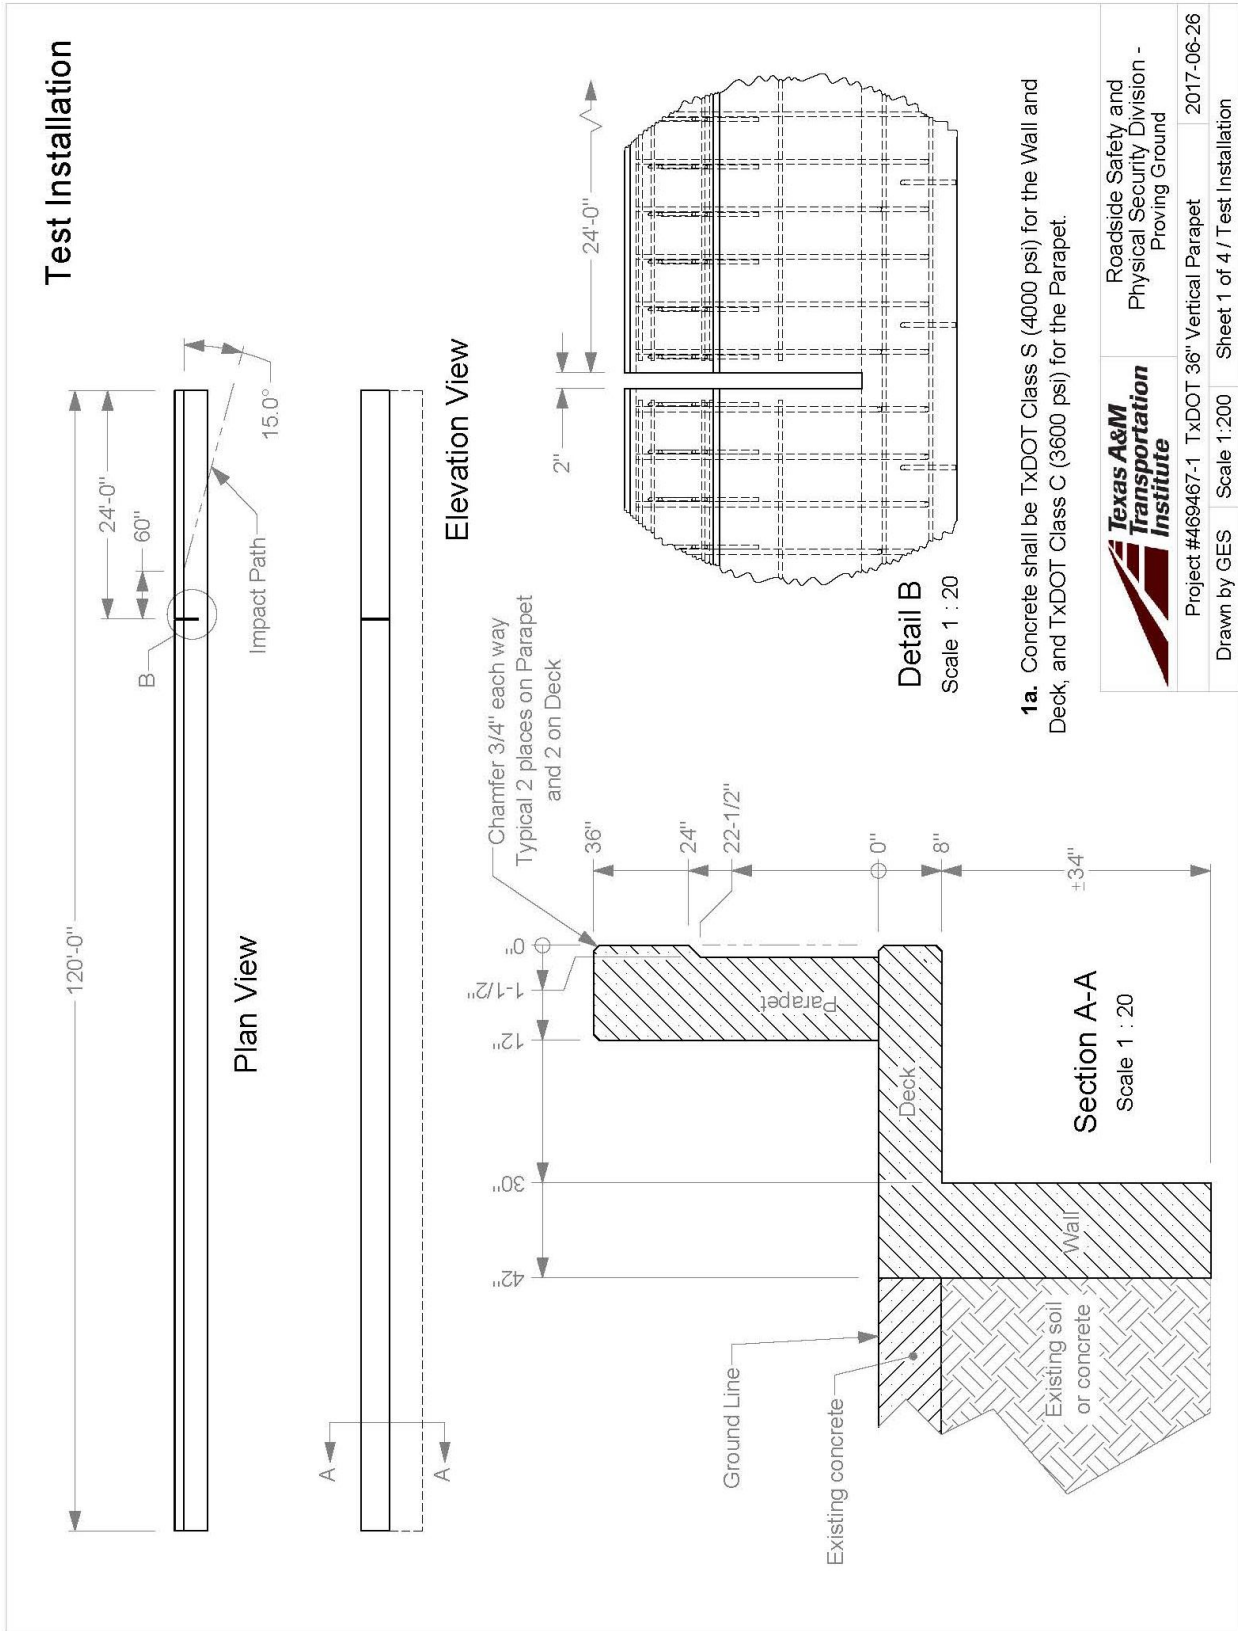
Overall Details of the TxDOT 36-inch Vertical Concrete Bridge Rail.
